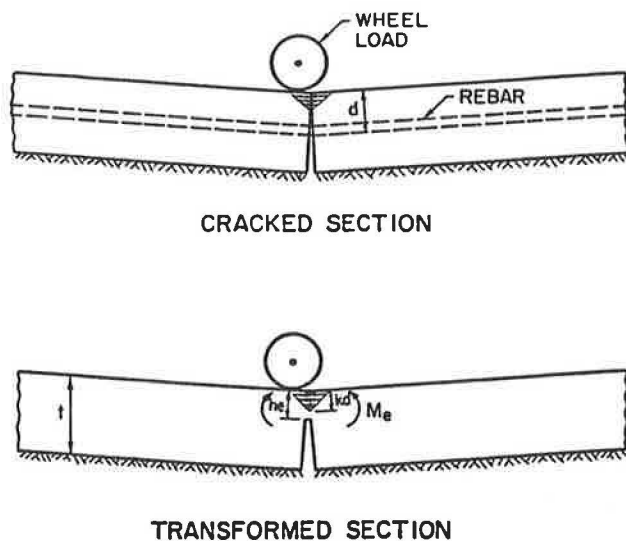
Transformation of cracked CRC pavement section.
